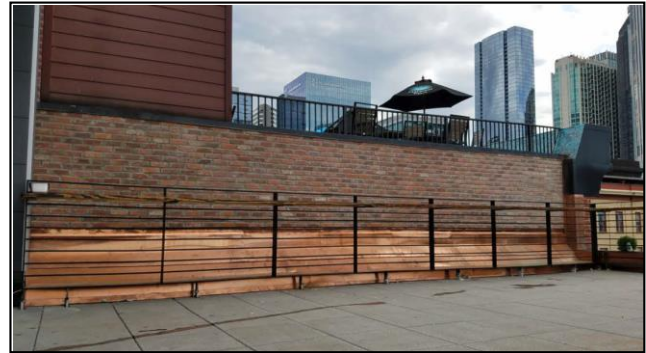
View of 217 Broadway from rooftop deck at 215 Broadway.
